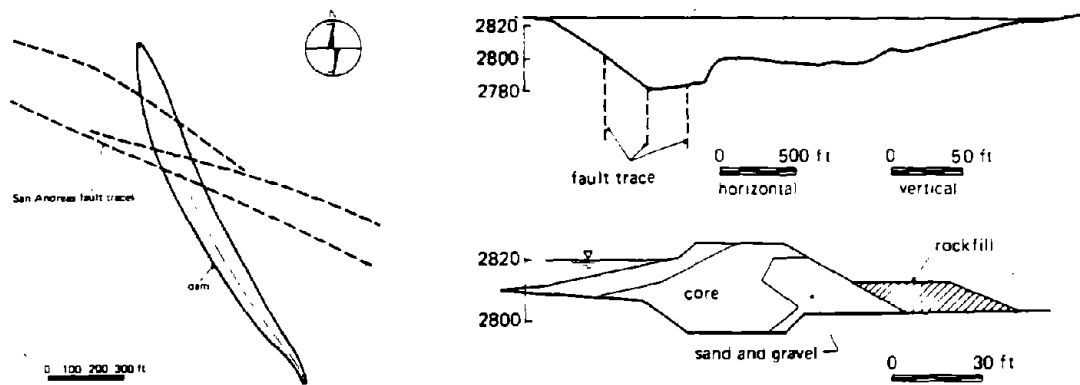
PALMDALE DAM IN PLAN VIEW, PROFILE AND CROSS SECTION (after Leps, 1989)
